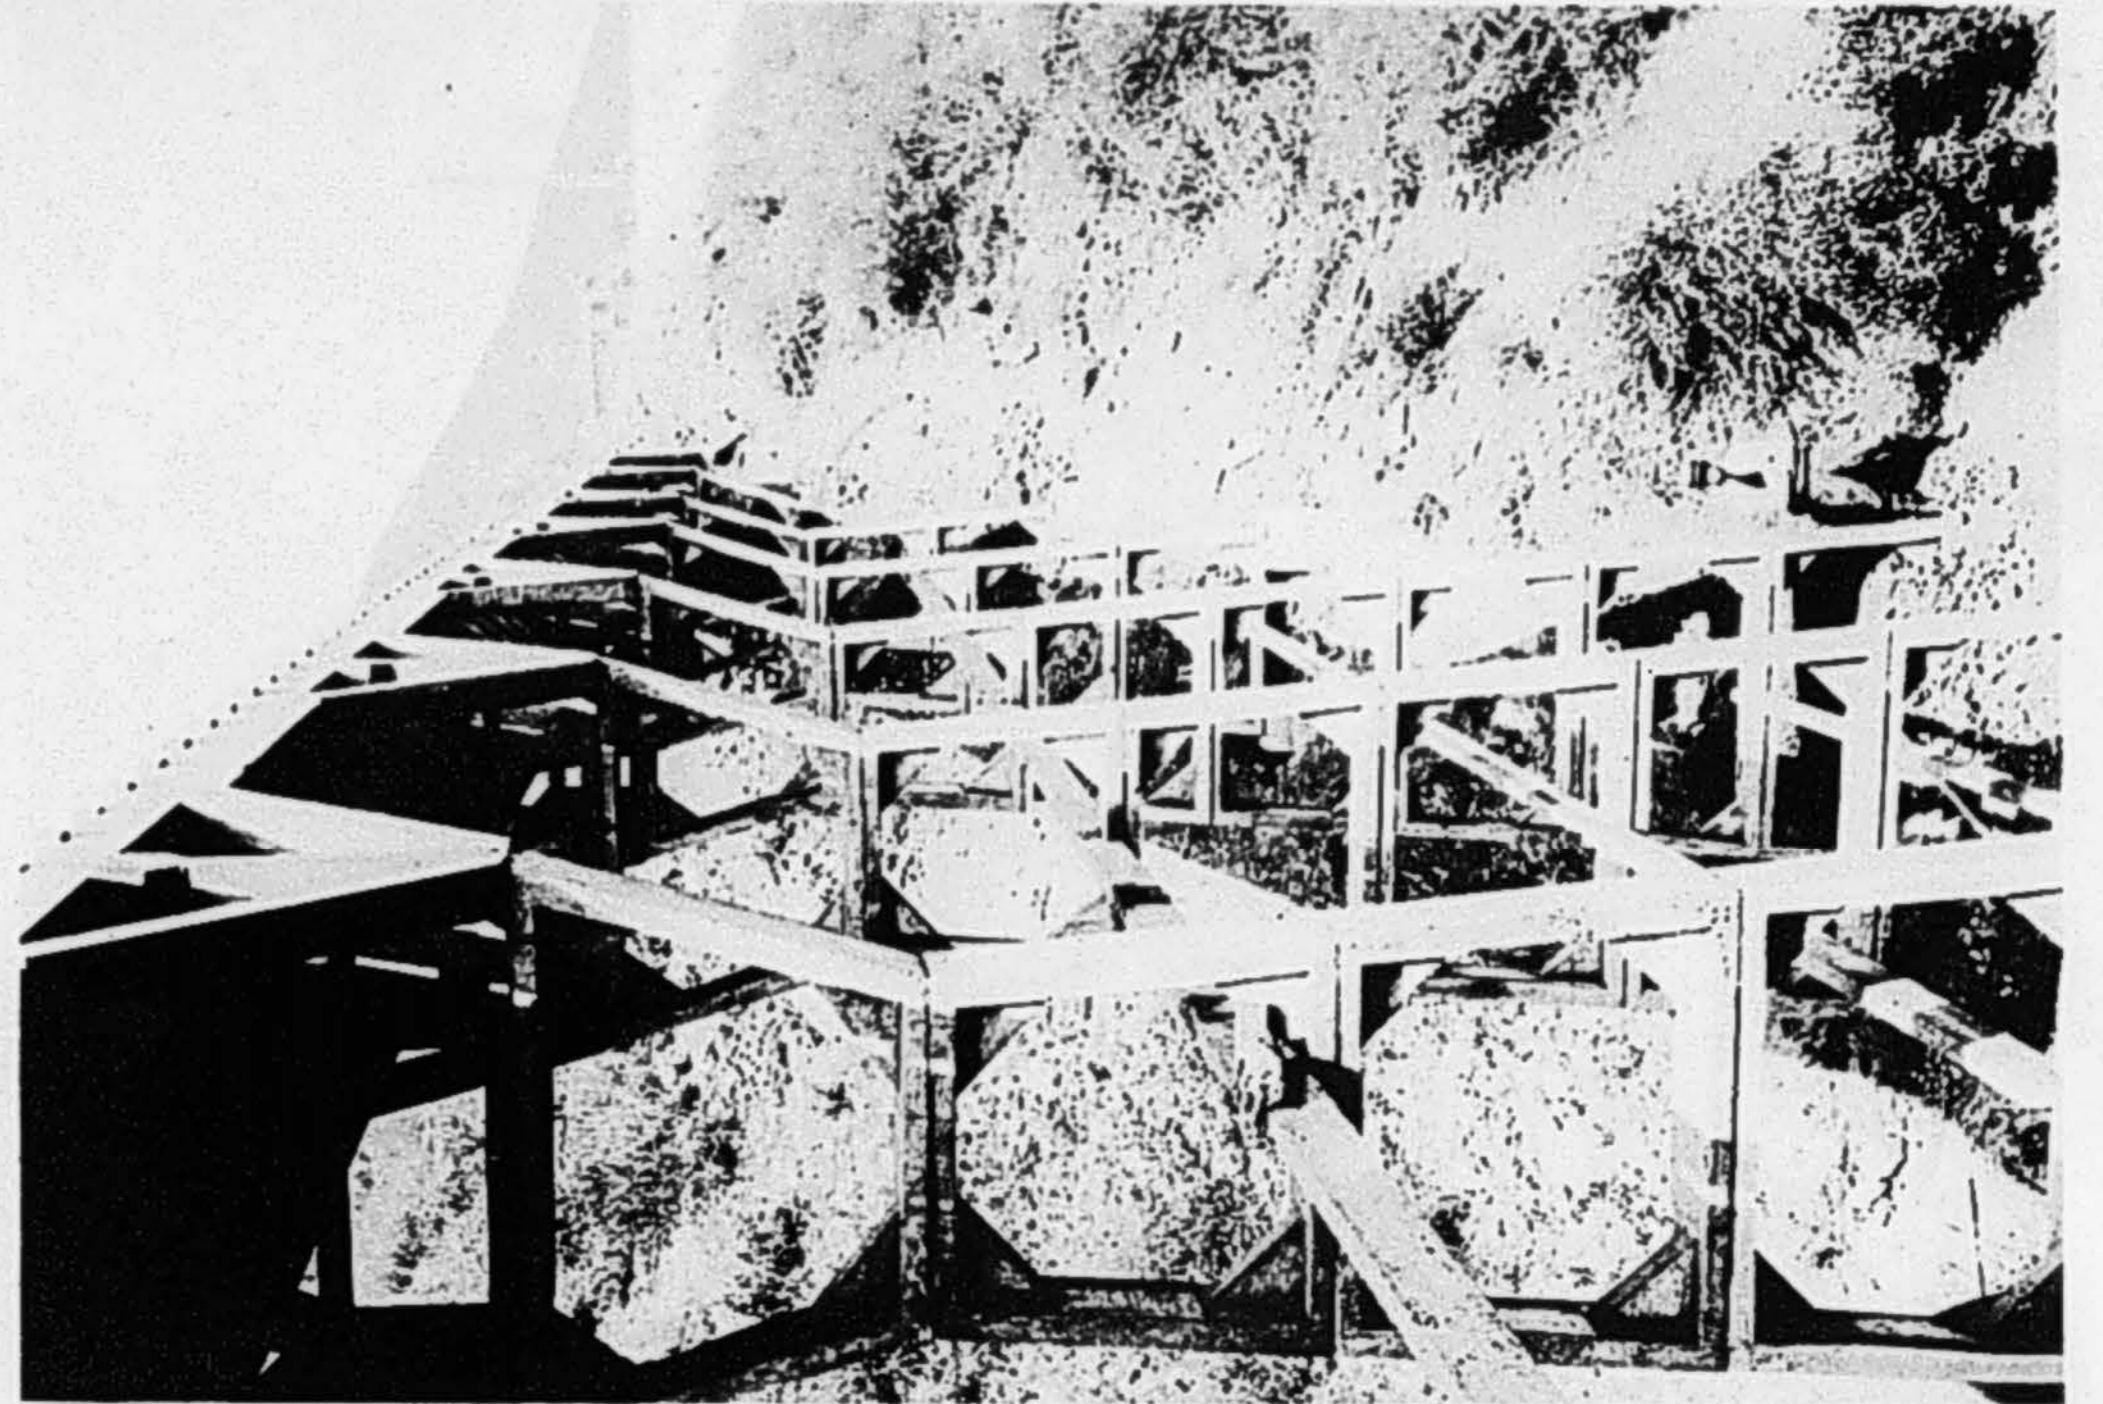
Concrete trestle on San Dieguito Mutual Water Company's System - a type similar to that to be used by San Luis Rey Irrigation District.
